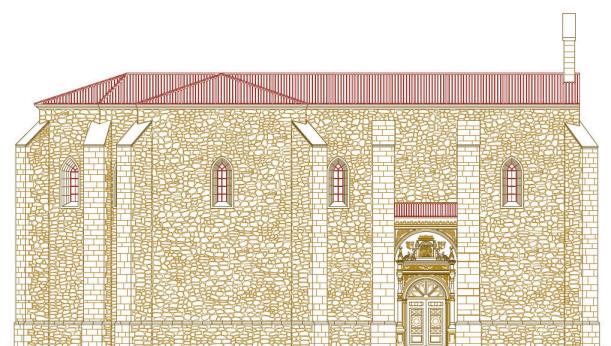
Reconstruction of the main elevation of the Church of La Piedad. Drawing: Mireya Ibarra Pérez.
